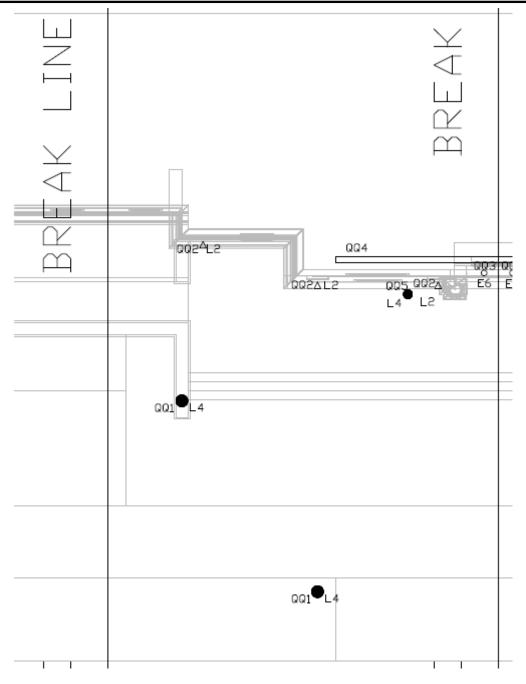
East Entry and Façade Lighting Plan – South Side of Entry
